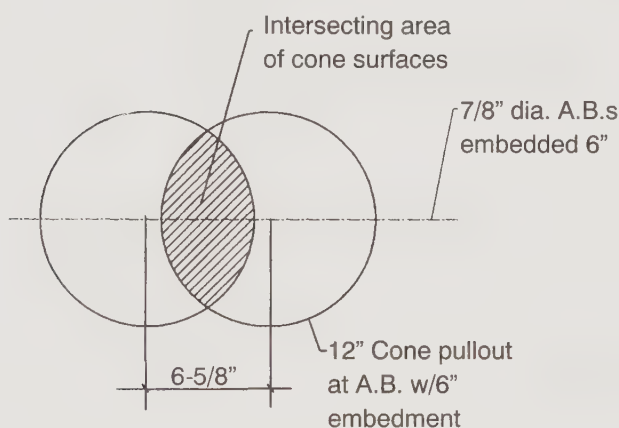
Intersection of anchor bolt tension failure cones
